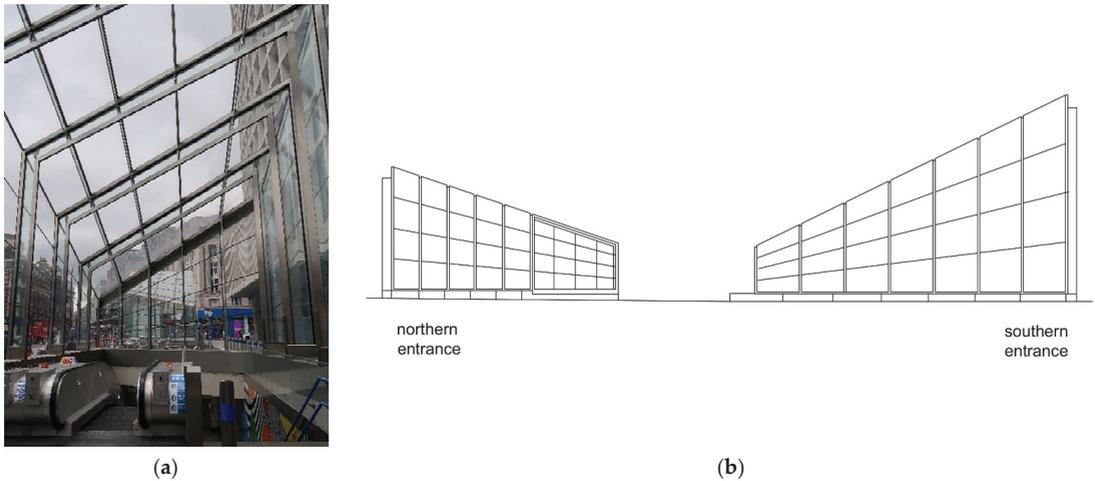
The Tottenham Court Road Station in London: (a) view from inside (photo by the author); (b) western facades of pavilions from Charing Cross Road (figure by the author).
